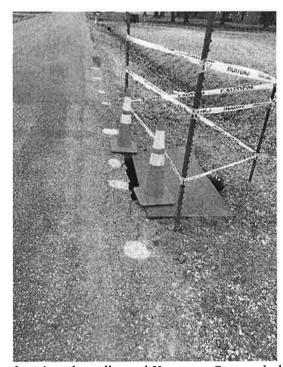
Photograph showing the collapsed Keystone St. manhole constructed in 1968.
